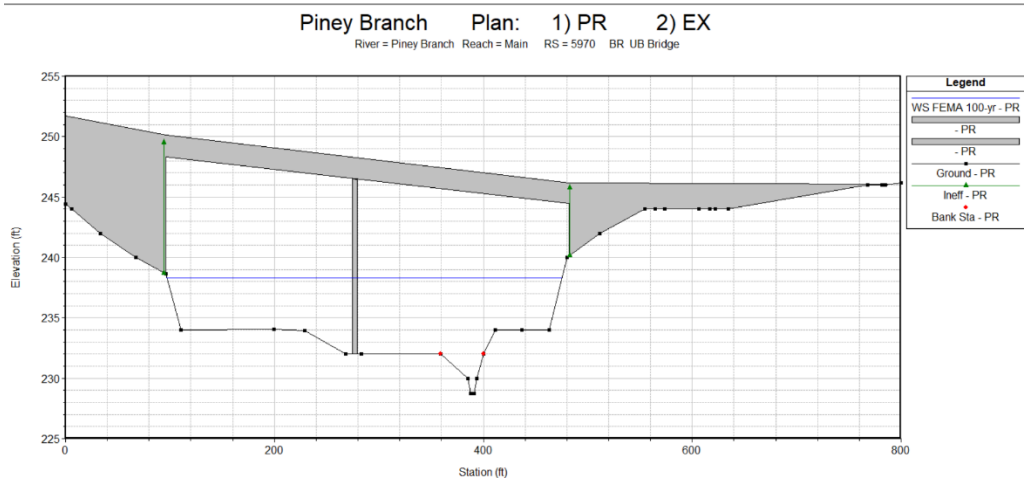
Bridge Upstream Internal Cross Section Proposed Geometry
